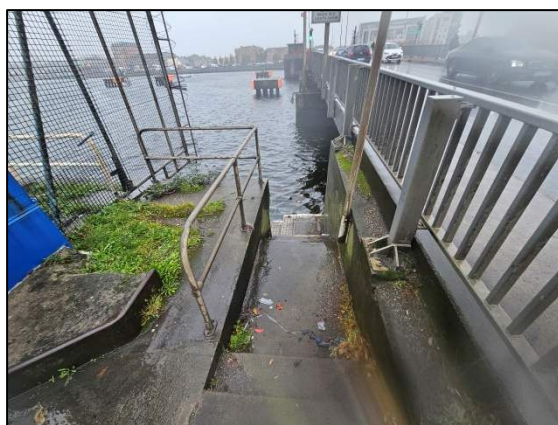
Access at northeast of site [JM: 30 October 2025].
